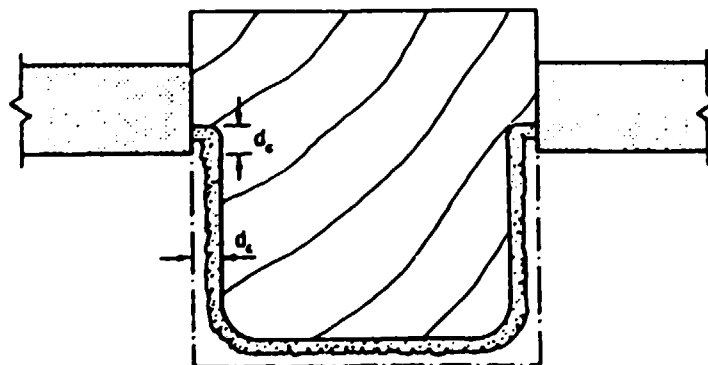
Details of Charring at Junction with Fire Proof Barrier
